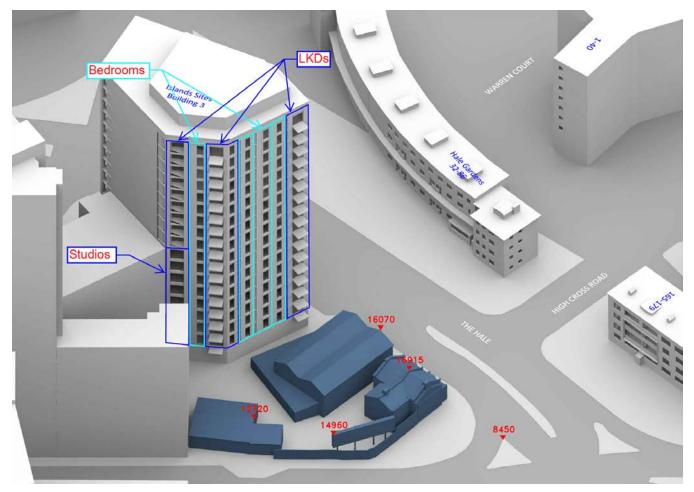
Annotated 3D view of Building 3 showing how the room uses stack vertically facing the Site
